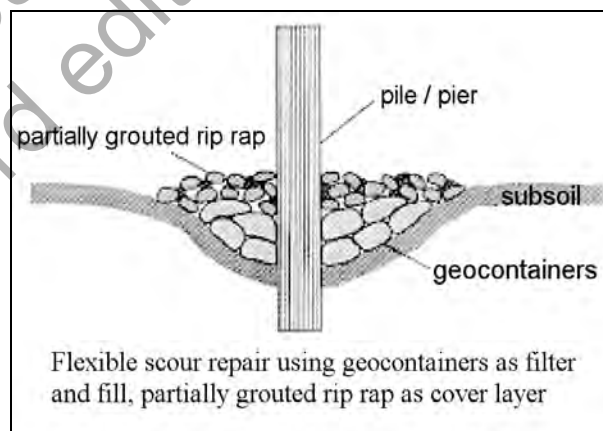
Schematic of pier scour repair using geocontainers as filter and fill, and partially grouted riprap as cover layer.⁽⁴³⁾
